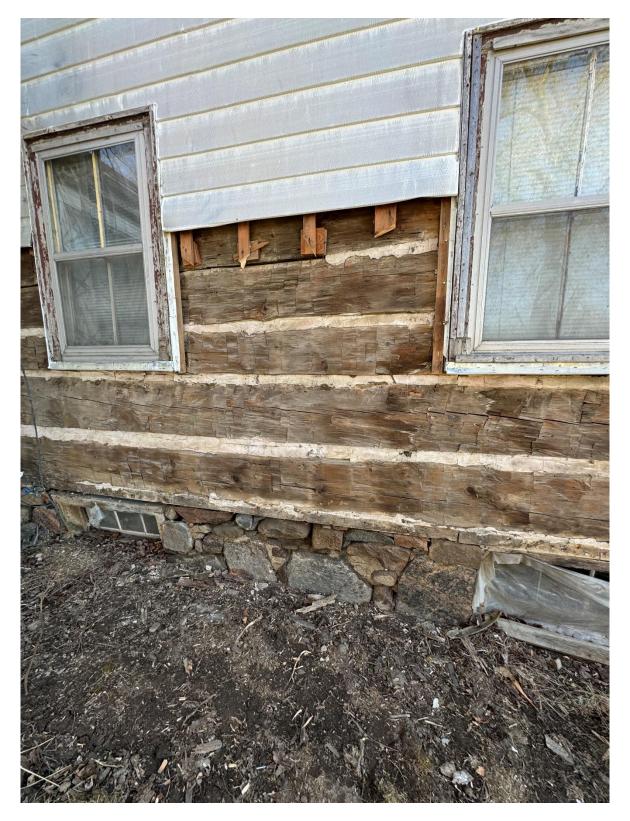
East elevation, exposed rubble foundation, crumbling mortar and chinking
